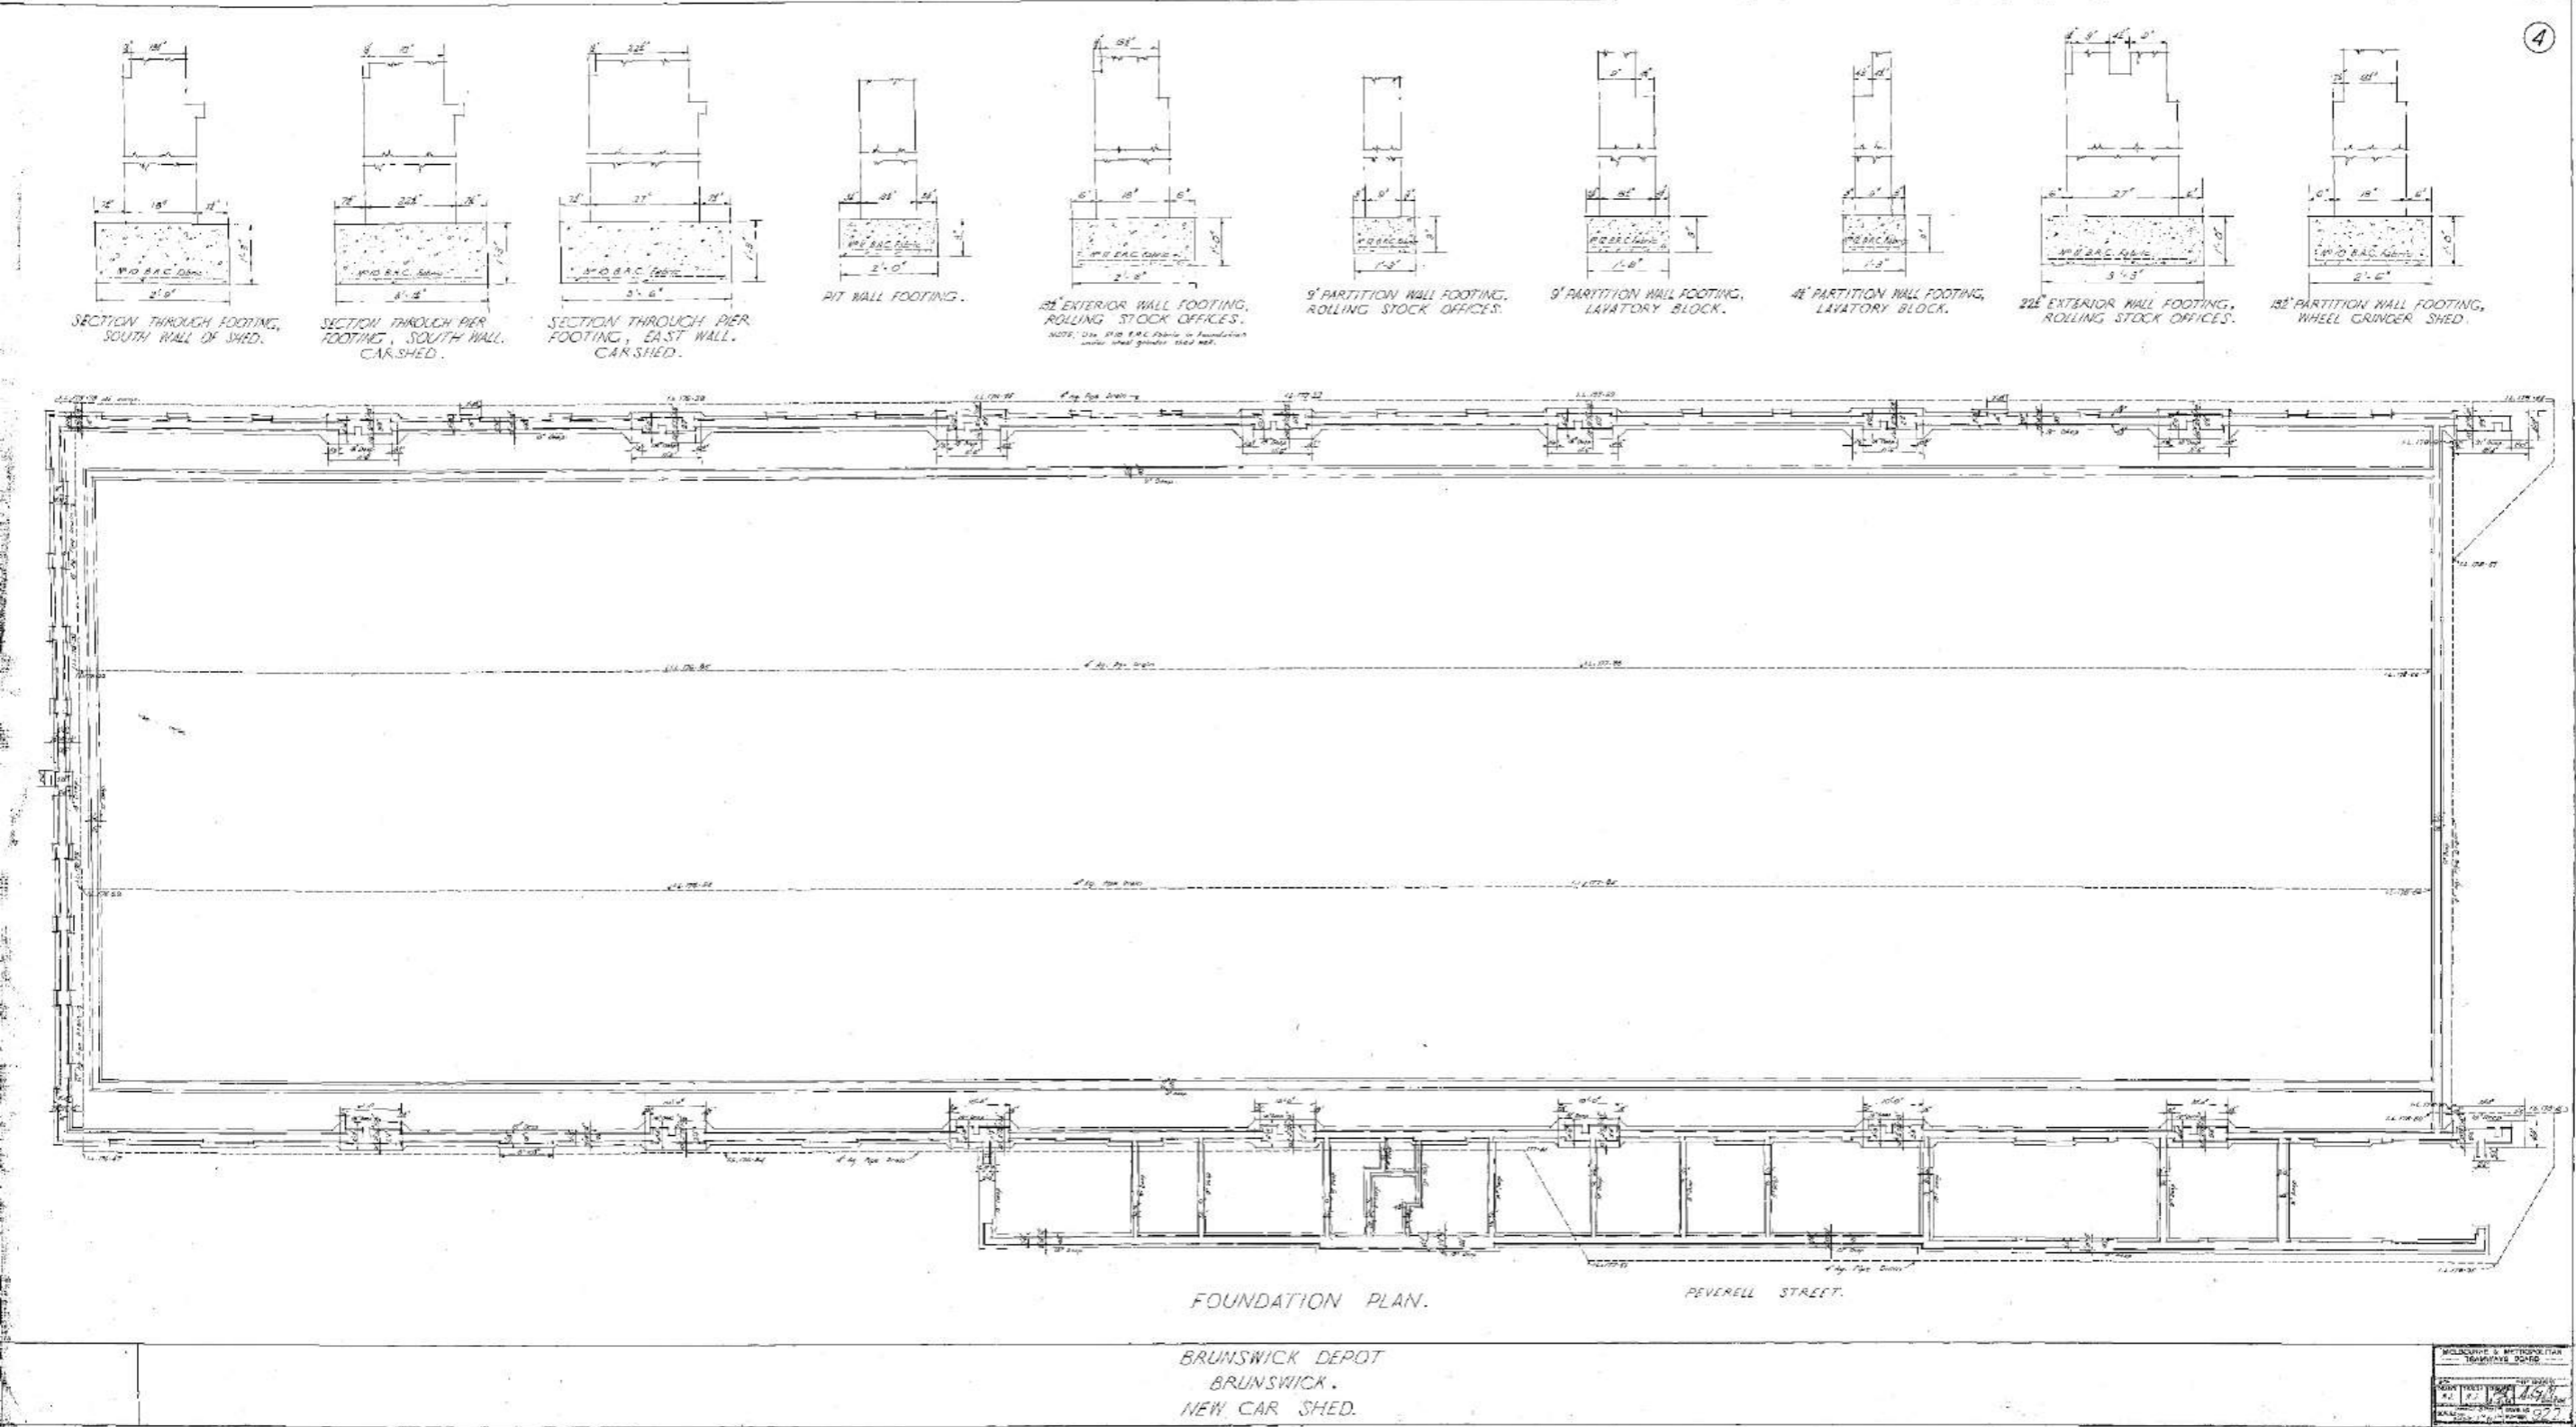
MMTB's 1935 plan of the car shed foundation, showing the floorplan, along with a variety of sections of the wall footings. This plan shows the location of the pit within the tram car shed, along with the workshops along Peveril Street which comprises 14 rooms
